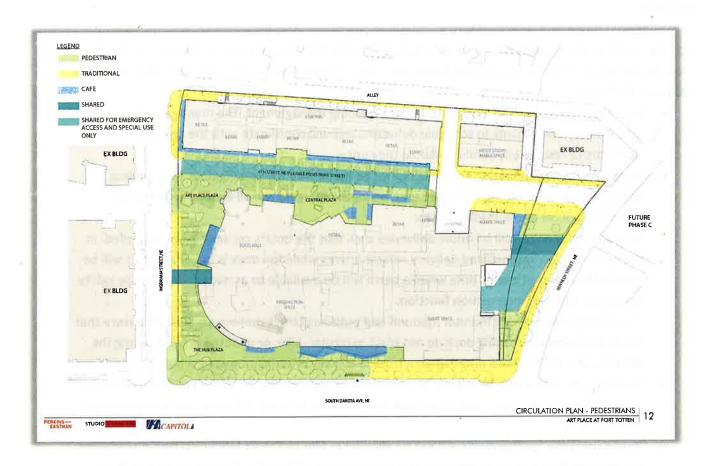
Project Site Plan (Source: Supplemental Submission, Exhibit A, Page 12, March 15, 2019)
